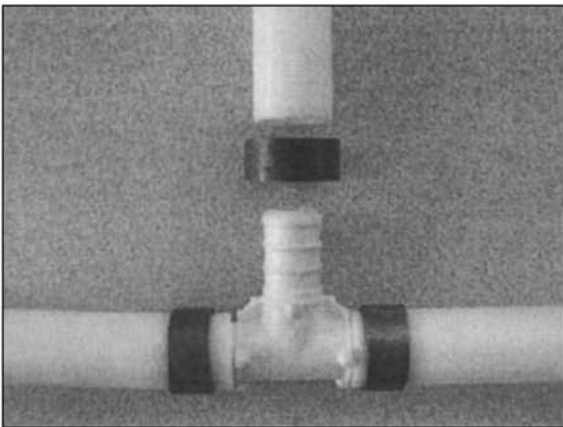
Plastic Insert Fitting with Copper Crimp Ring
